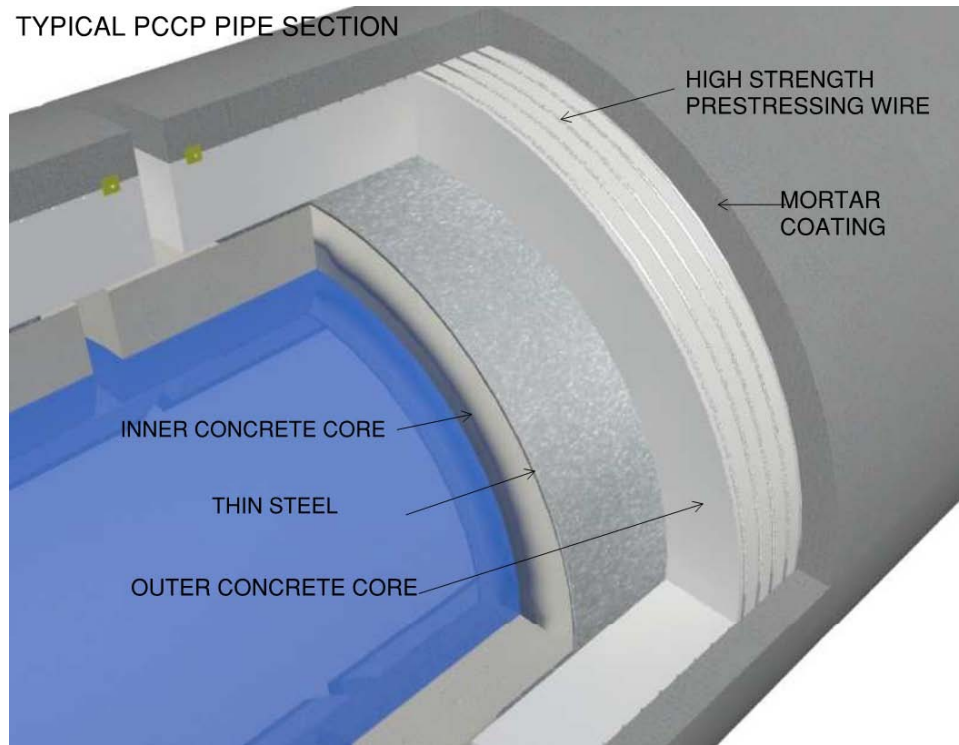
Components of an ECP-type Prestressed Concrete Cylinder Pipe Section
